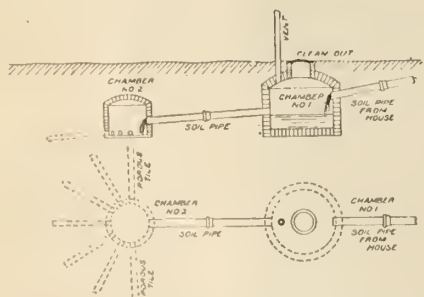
Fig. A.—Sectional elevation and plan of tanks for septic treatment of sewage
